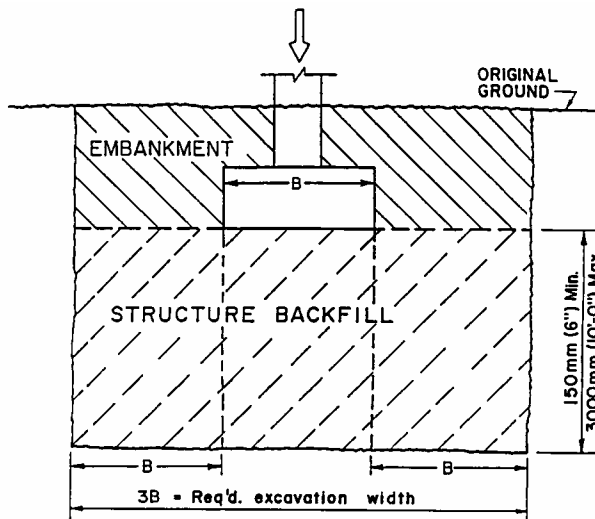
Unsuitable Material Replacement
